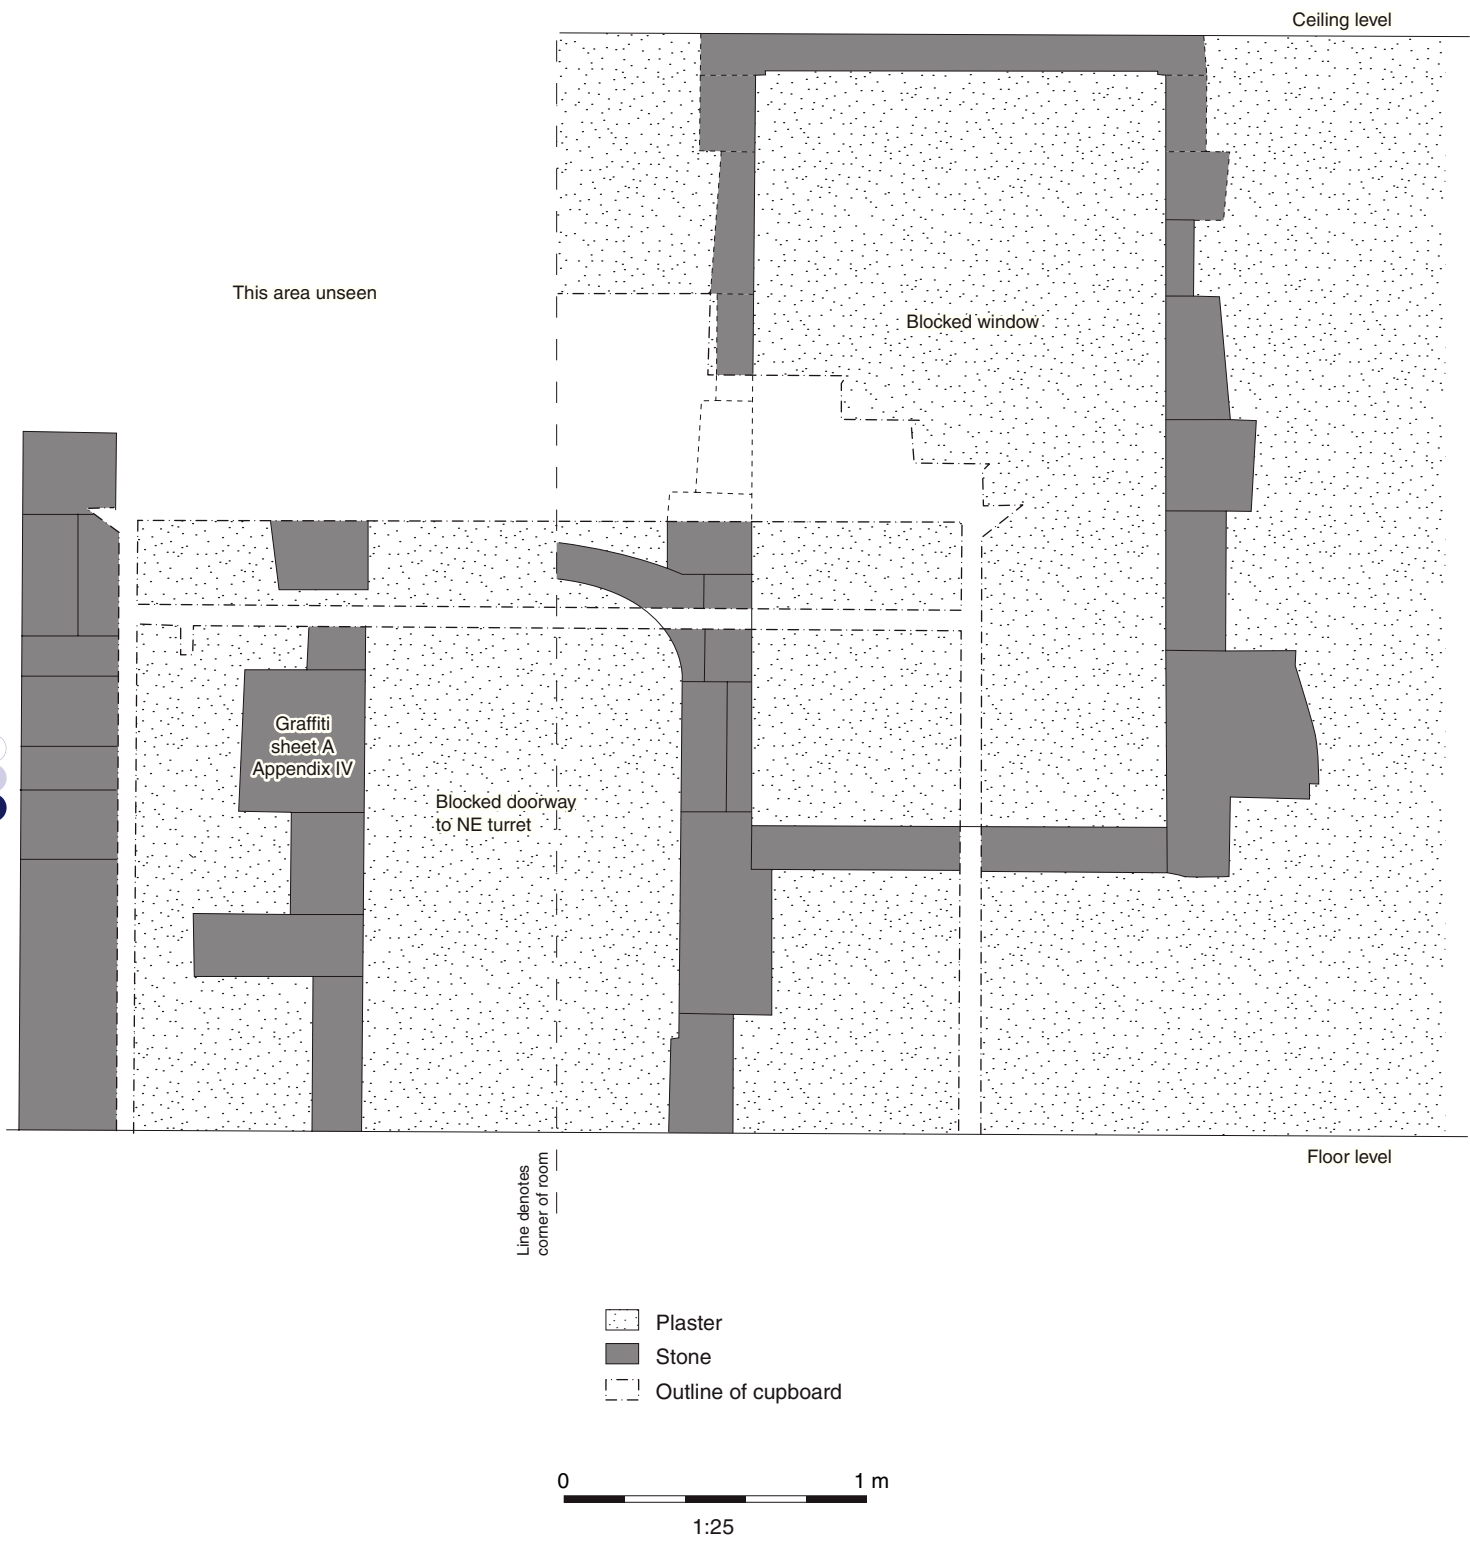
Interior elevation of room beneath clock room showing blocked window and doorway
